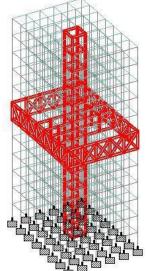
3D view of various cases of multistoried structure Structure 1 (S1) Regular building on plane ground
